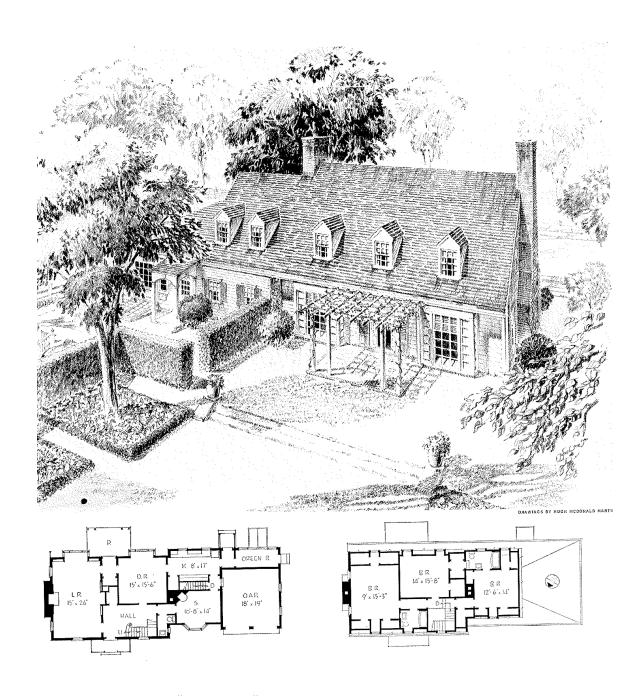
Floor Plan, "Floor Plan," House Beautiful, June 1941: 42.
